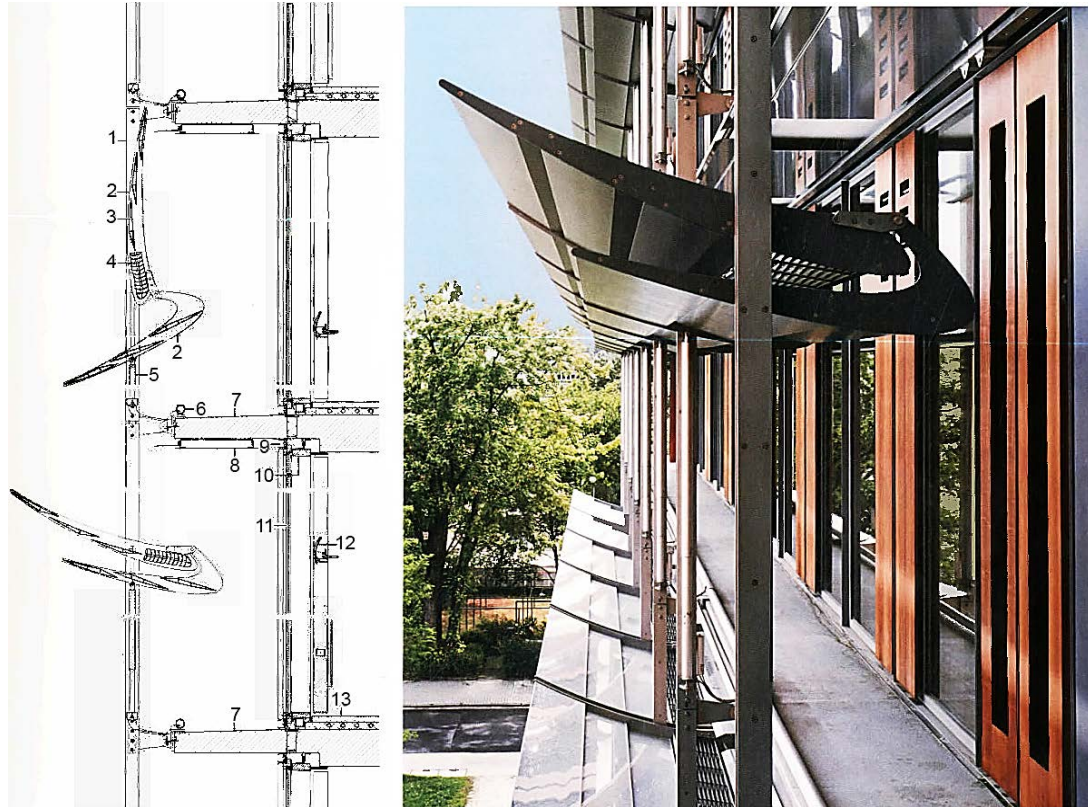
Office complex, Wiesbaden, north façade with detailed vertical section
